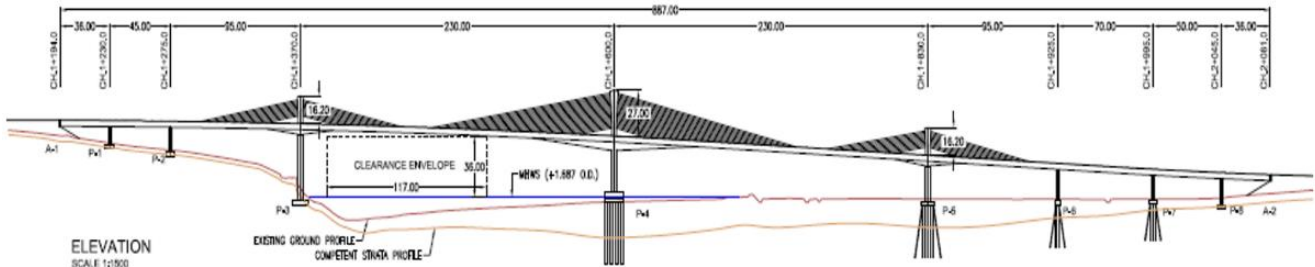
Bridge Span Arrangement – Click on the image to see it in full
